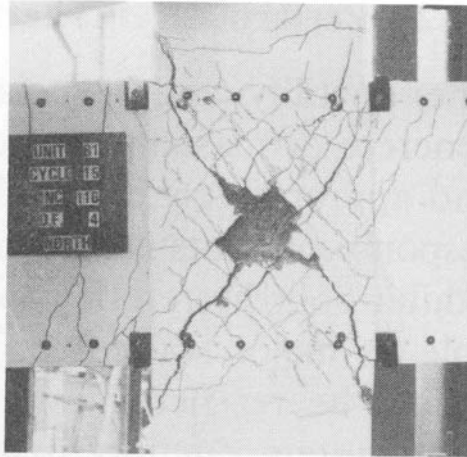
Crack pattern of a joint (Paulay and Priestley, 1992)
